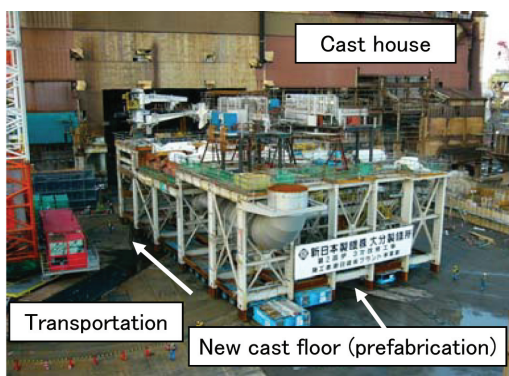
Prefabrication method of cast floor (relining of Oita No.2 blast furnace)
